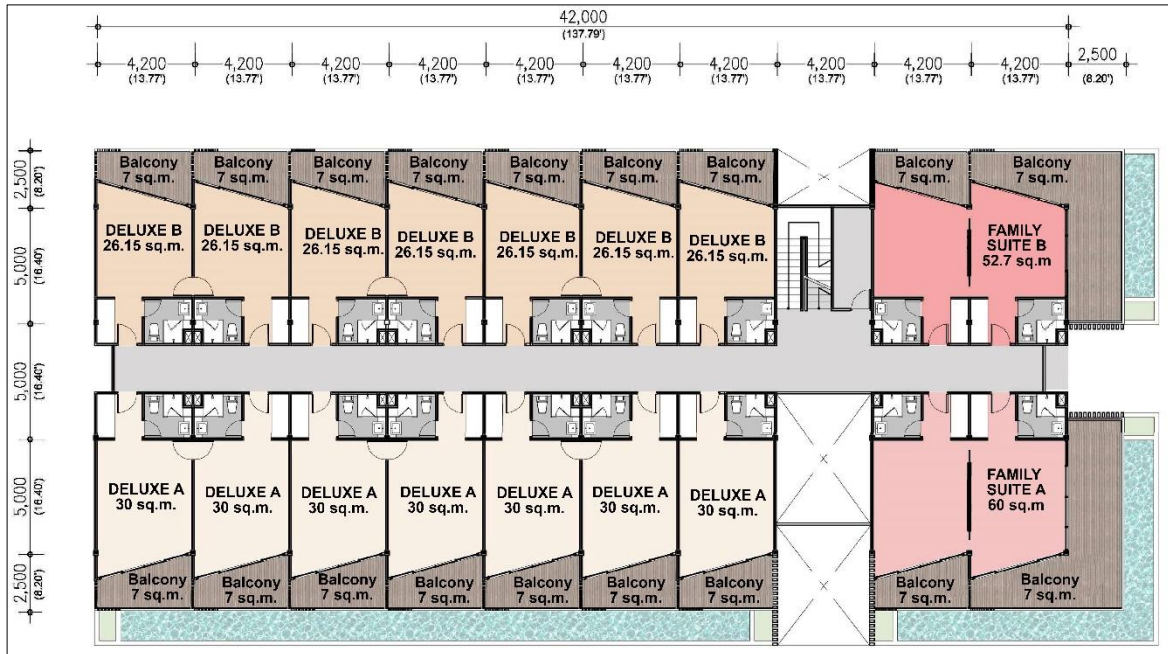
Layout Plan of New Three-Storey Building's First Floor
